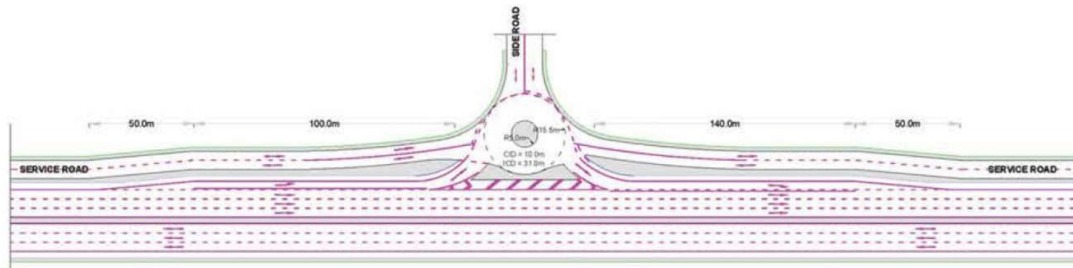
B Entry/Exit Arrangement with a Side Road where Service Road Continuing
